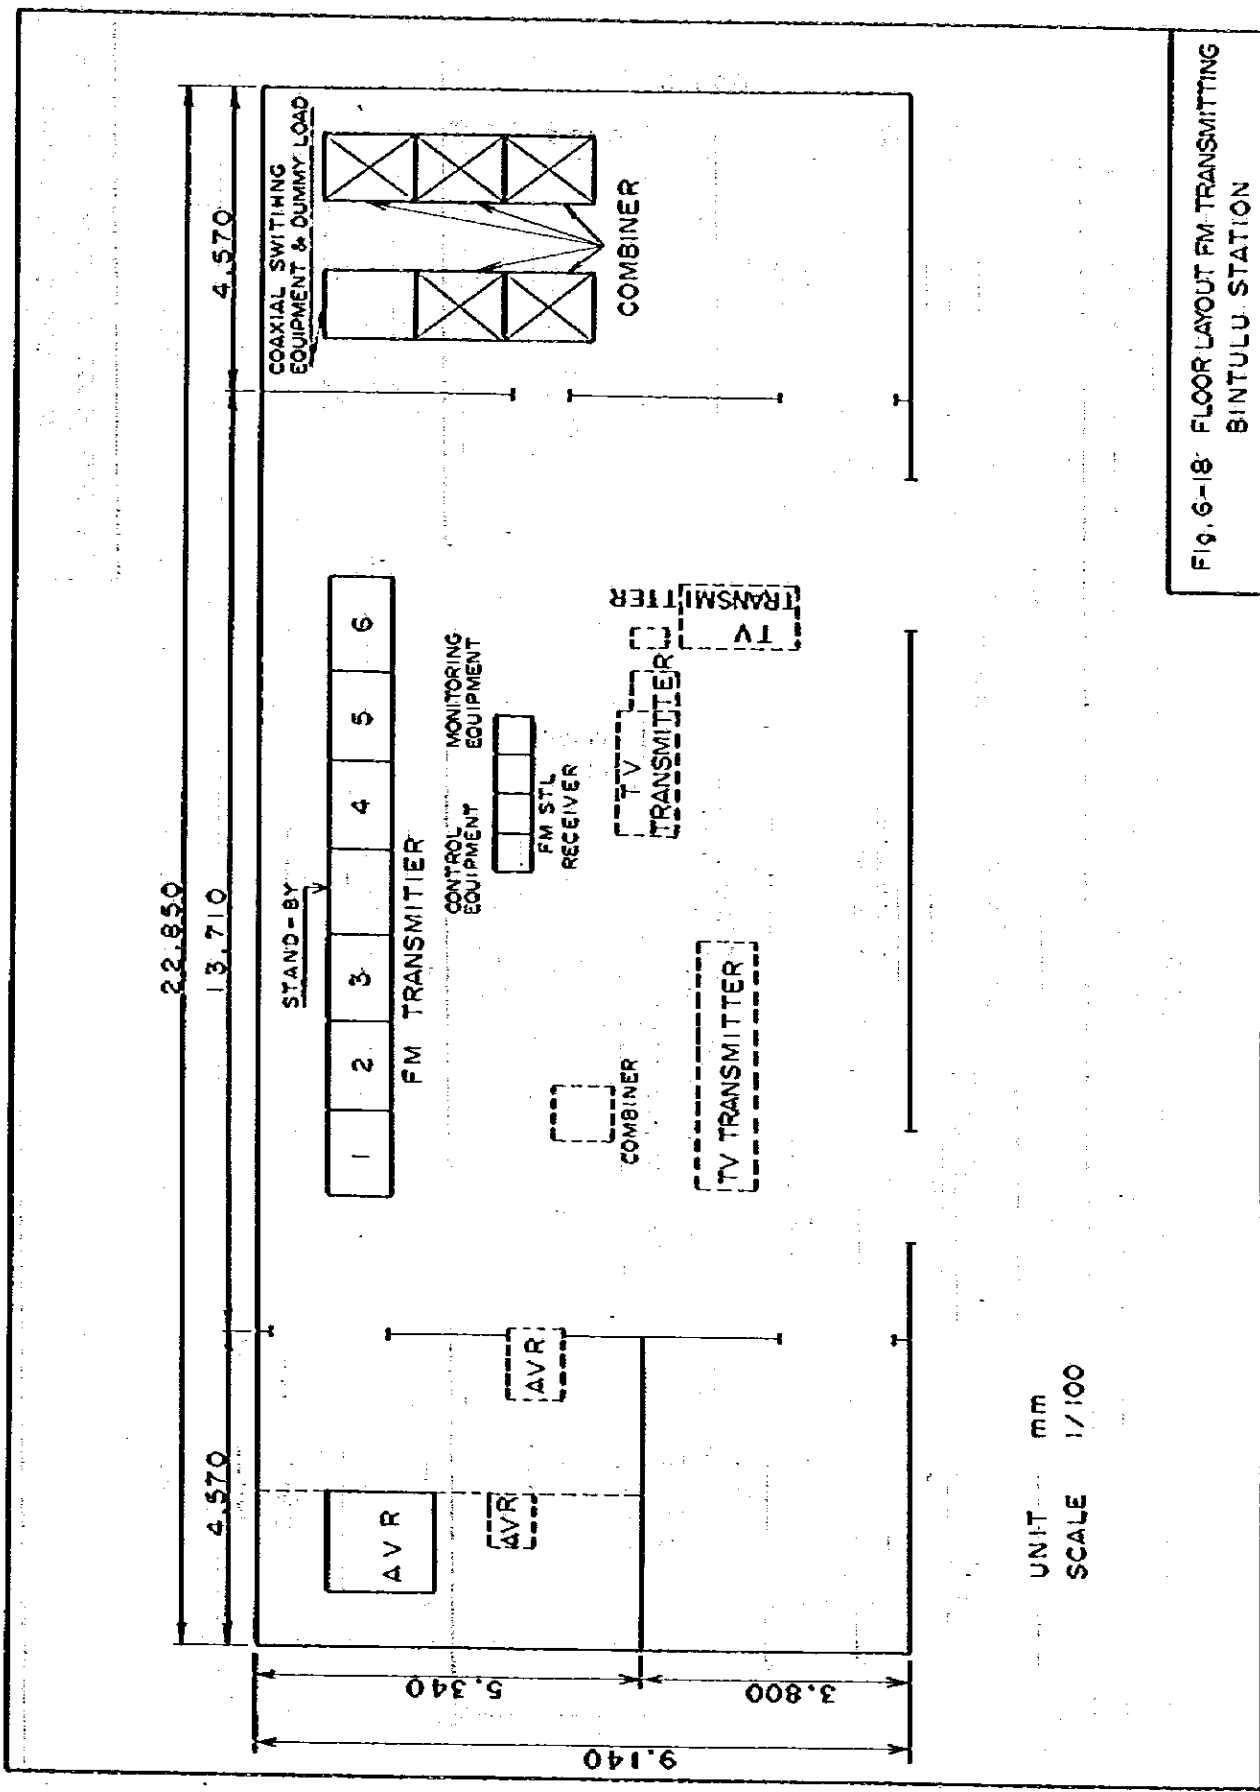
FLOOR LAYOUT FM TRANSMITTING BINTULU STATION
